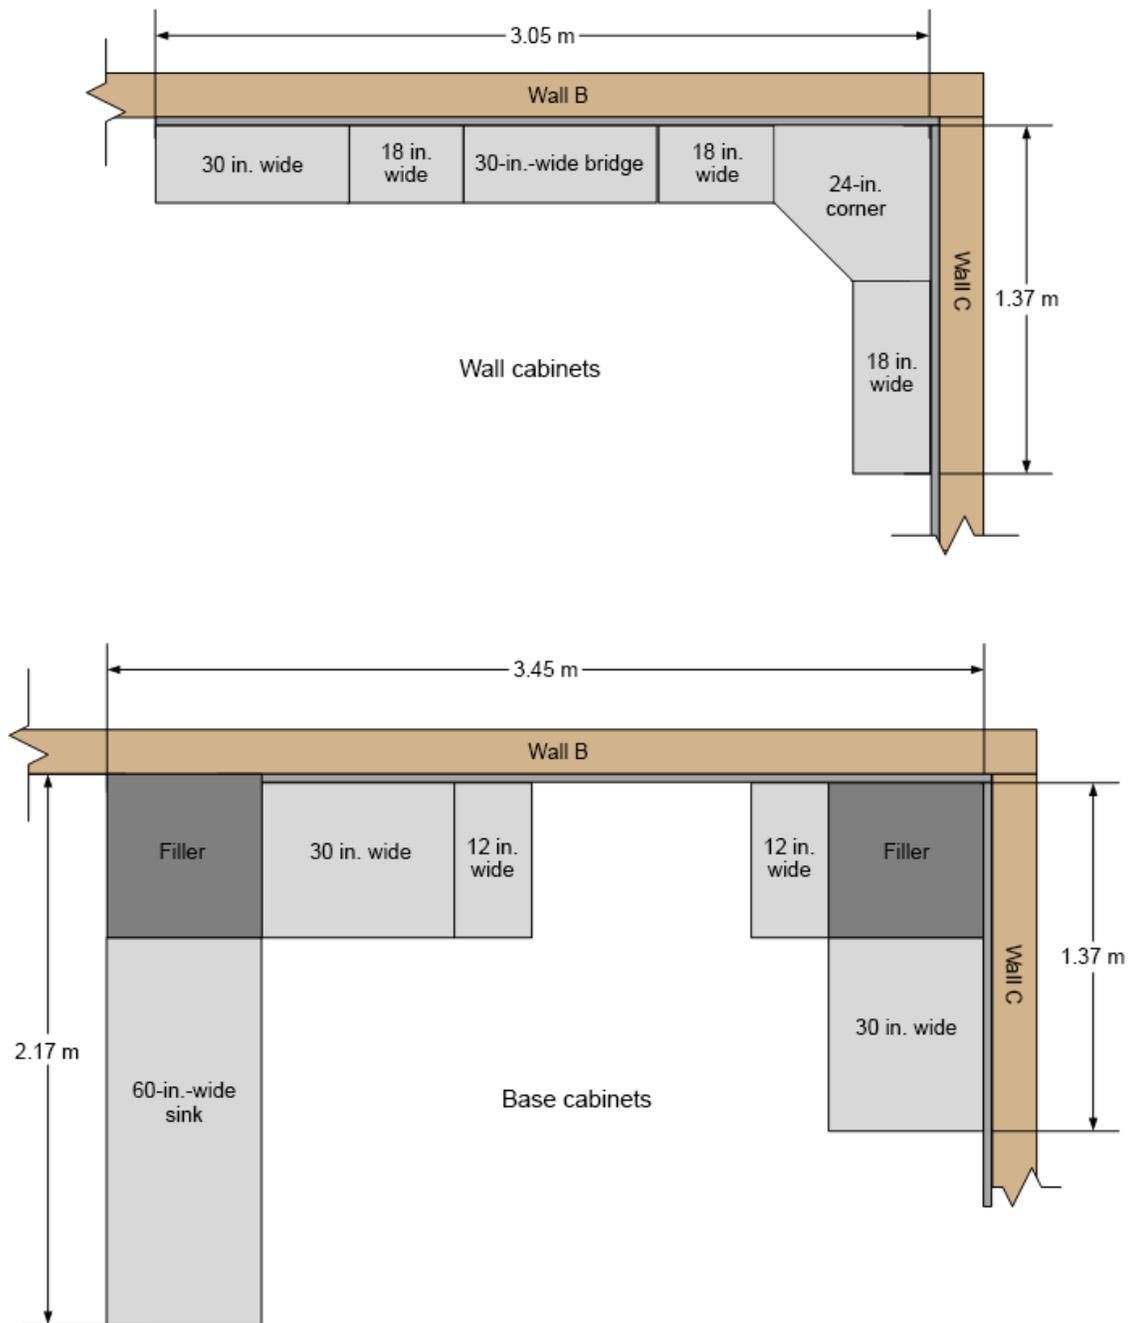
Plan view of wall cabinets and base cabinets in kitchen.
